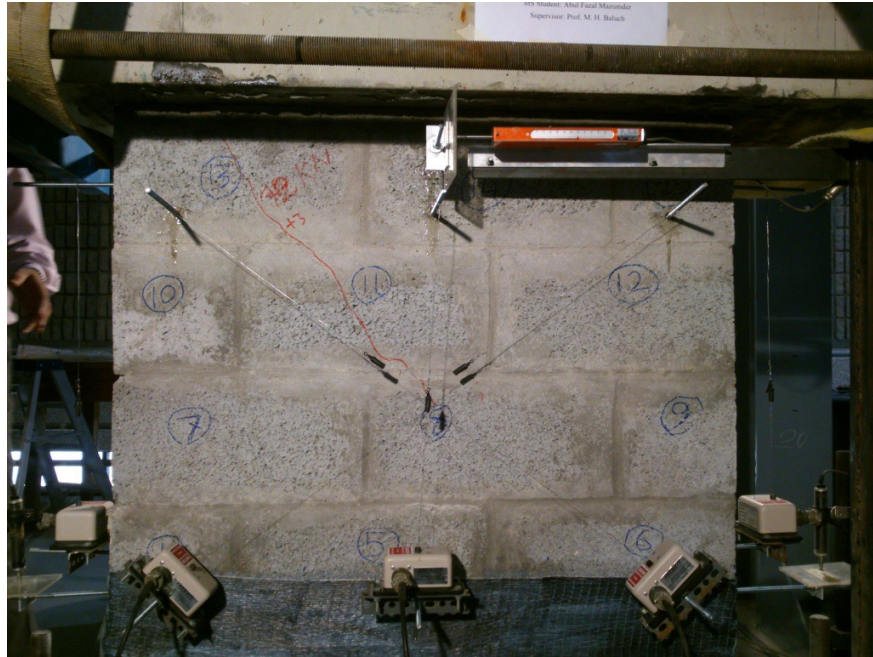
Damage Associated with 2.4 mm Push Loading, NCMW Wall
